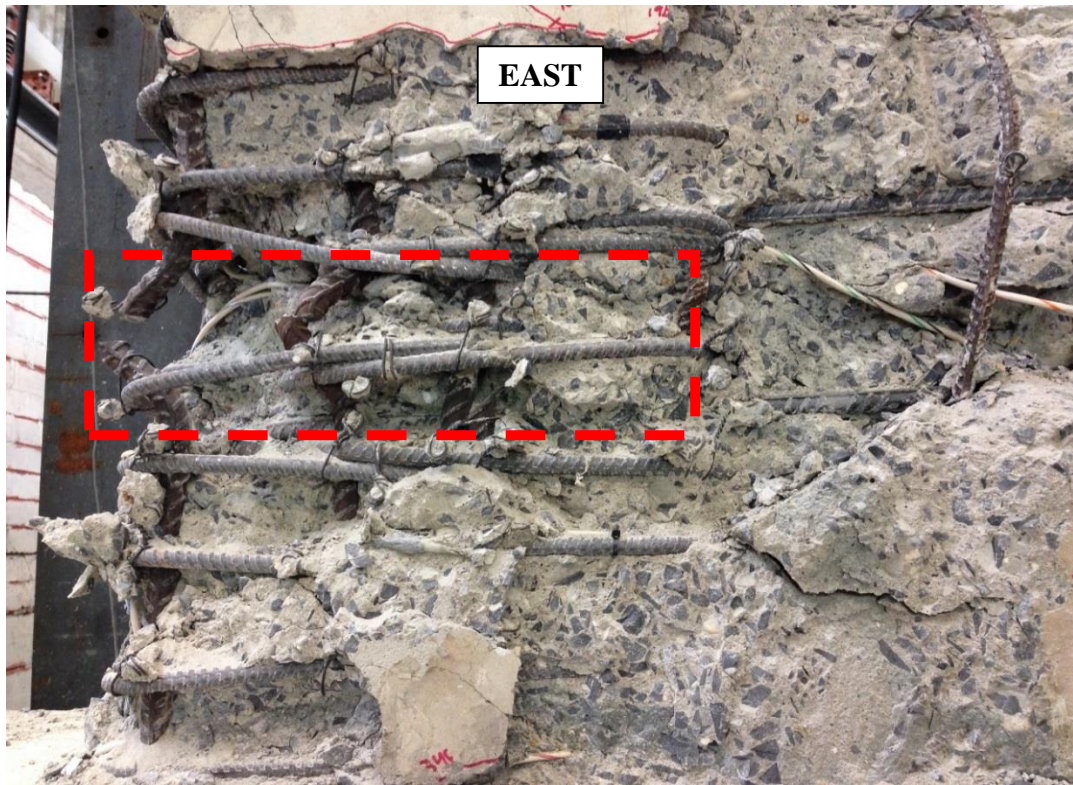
Photographs of confined concrete conditions at the end of the test Wall
